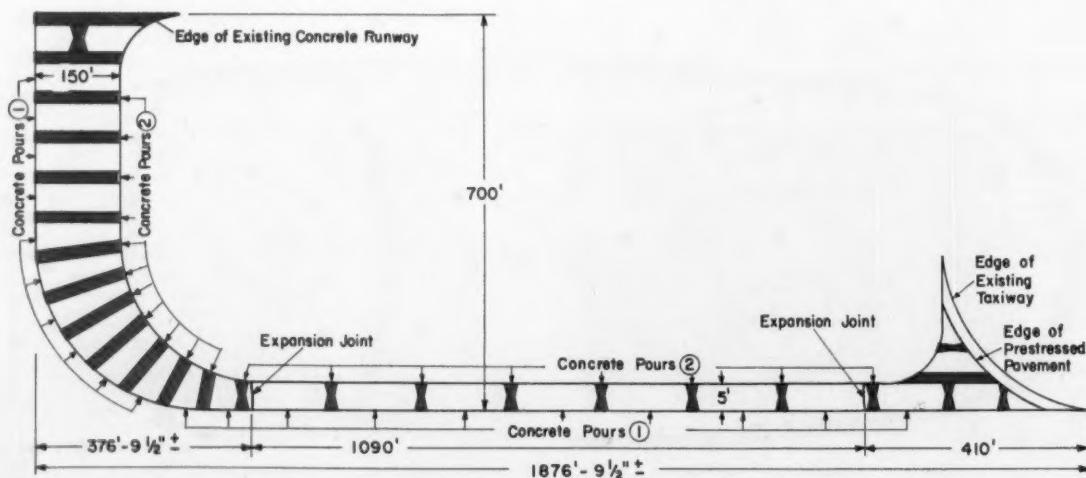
Plan of taxiway shows proposed method of pouring concrete for main slab sections and gaps.
